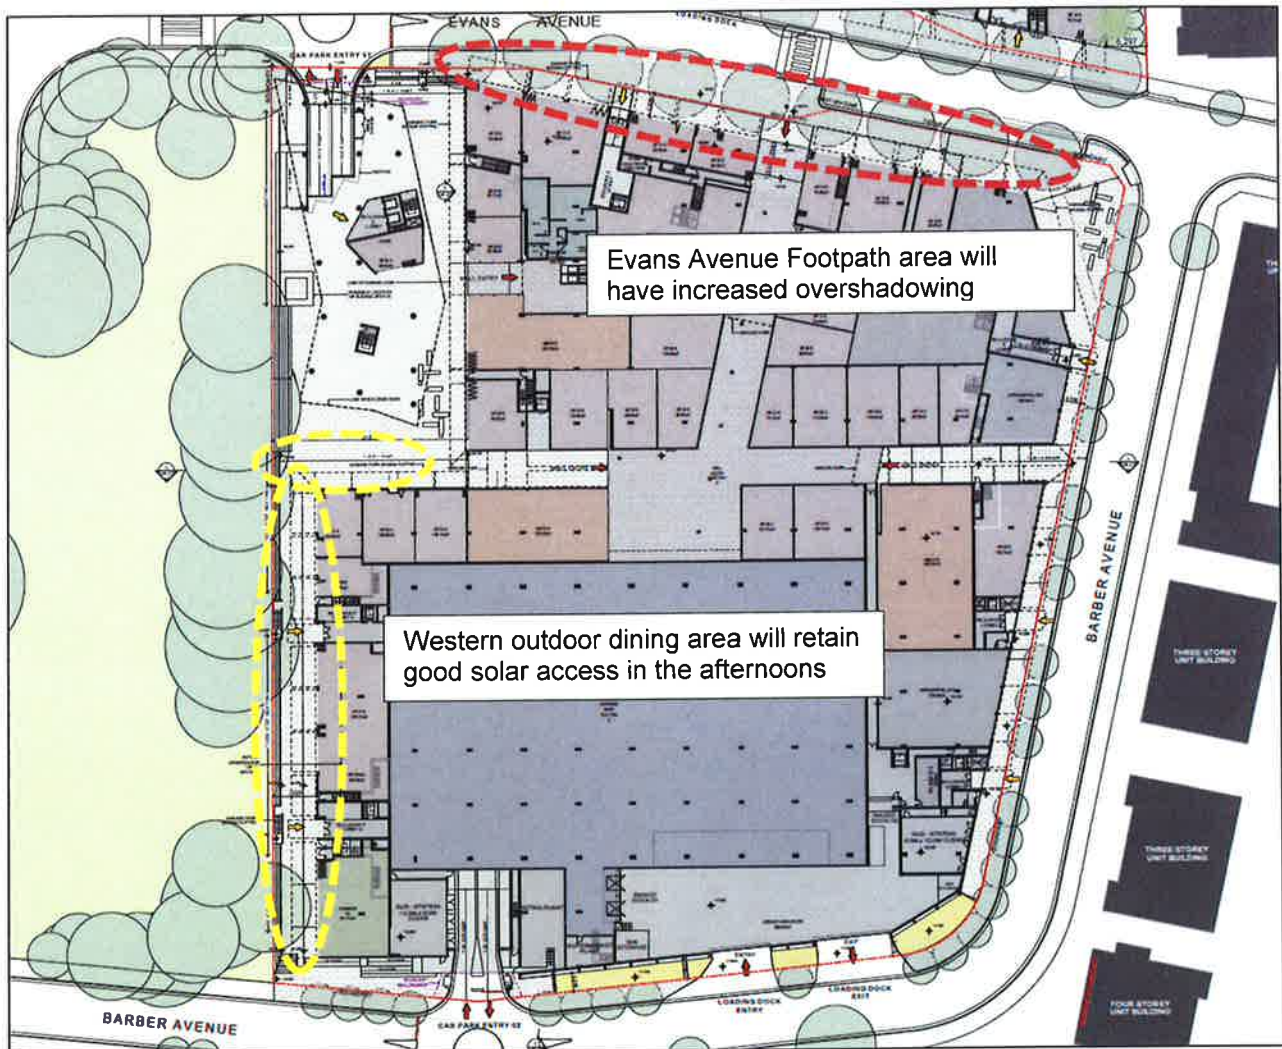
Approved layout of southern site showing the area on Evans Avenue that will be additionally overshadowed by the proposed building and the area overlooking the park that will have good solar access in the afternoons. (Base image source: approved plans)
